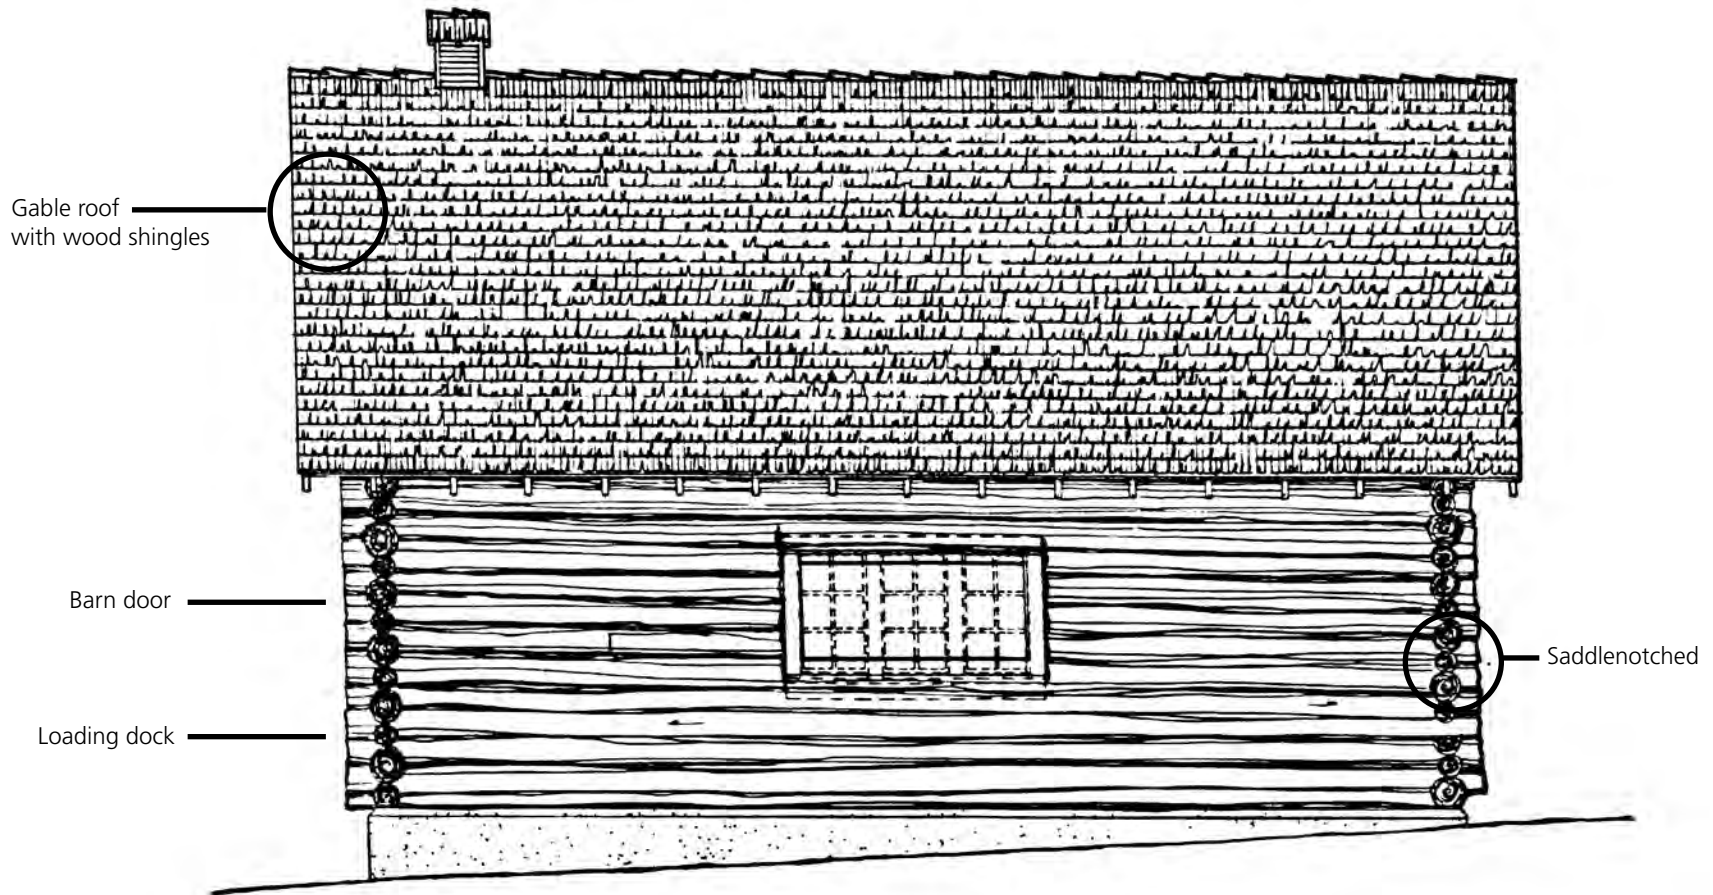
Building 101, South Elevation, Historic American Building Survey, National Park Service, W. Vandeventer and Dave Snow, 1986 (NPS Alaska Regional Office Files)
